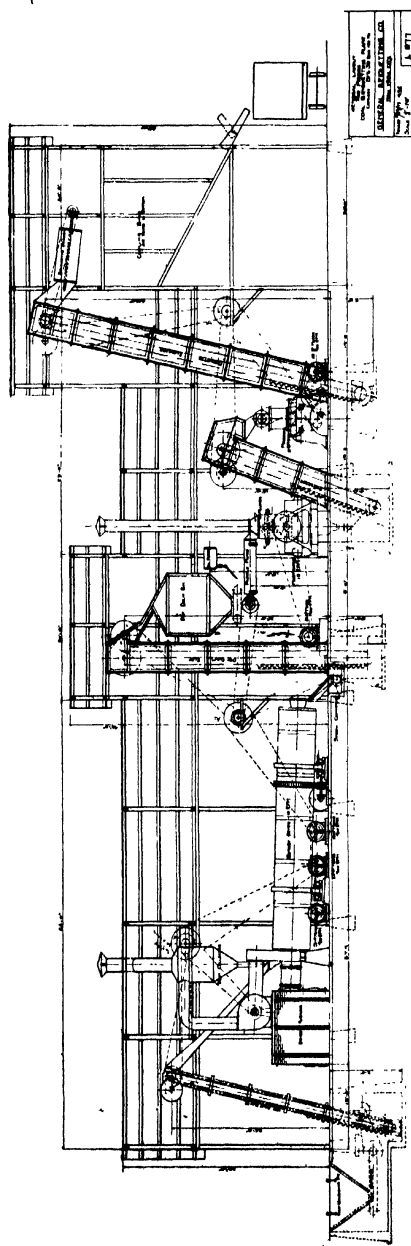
Layout of Typical Coal Briquetting Plant. (Dutch Process).
